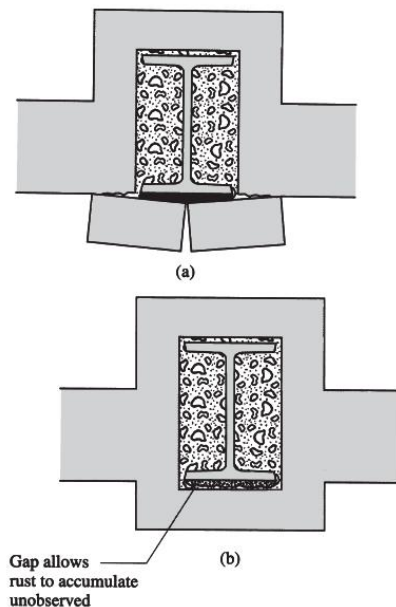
Rusting steel member encased in masonry: (a) Gaps between steel and masonry fully mortared; (b) Gaps left empty between steel and masonry.
